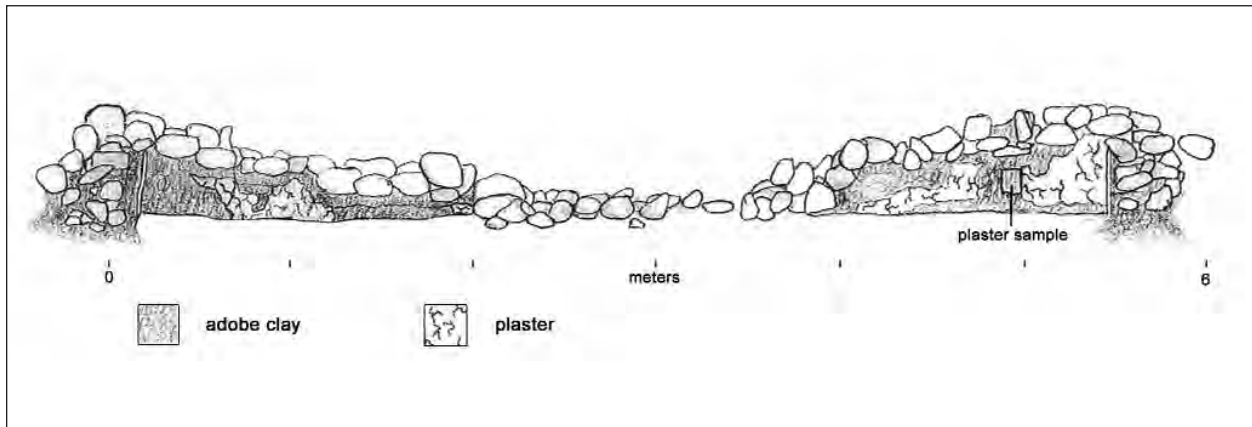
Elevation of doorway, Structure 2, LA 105710.
